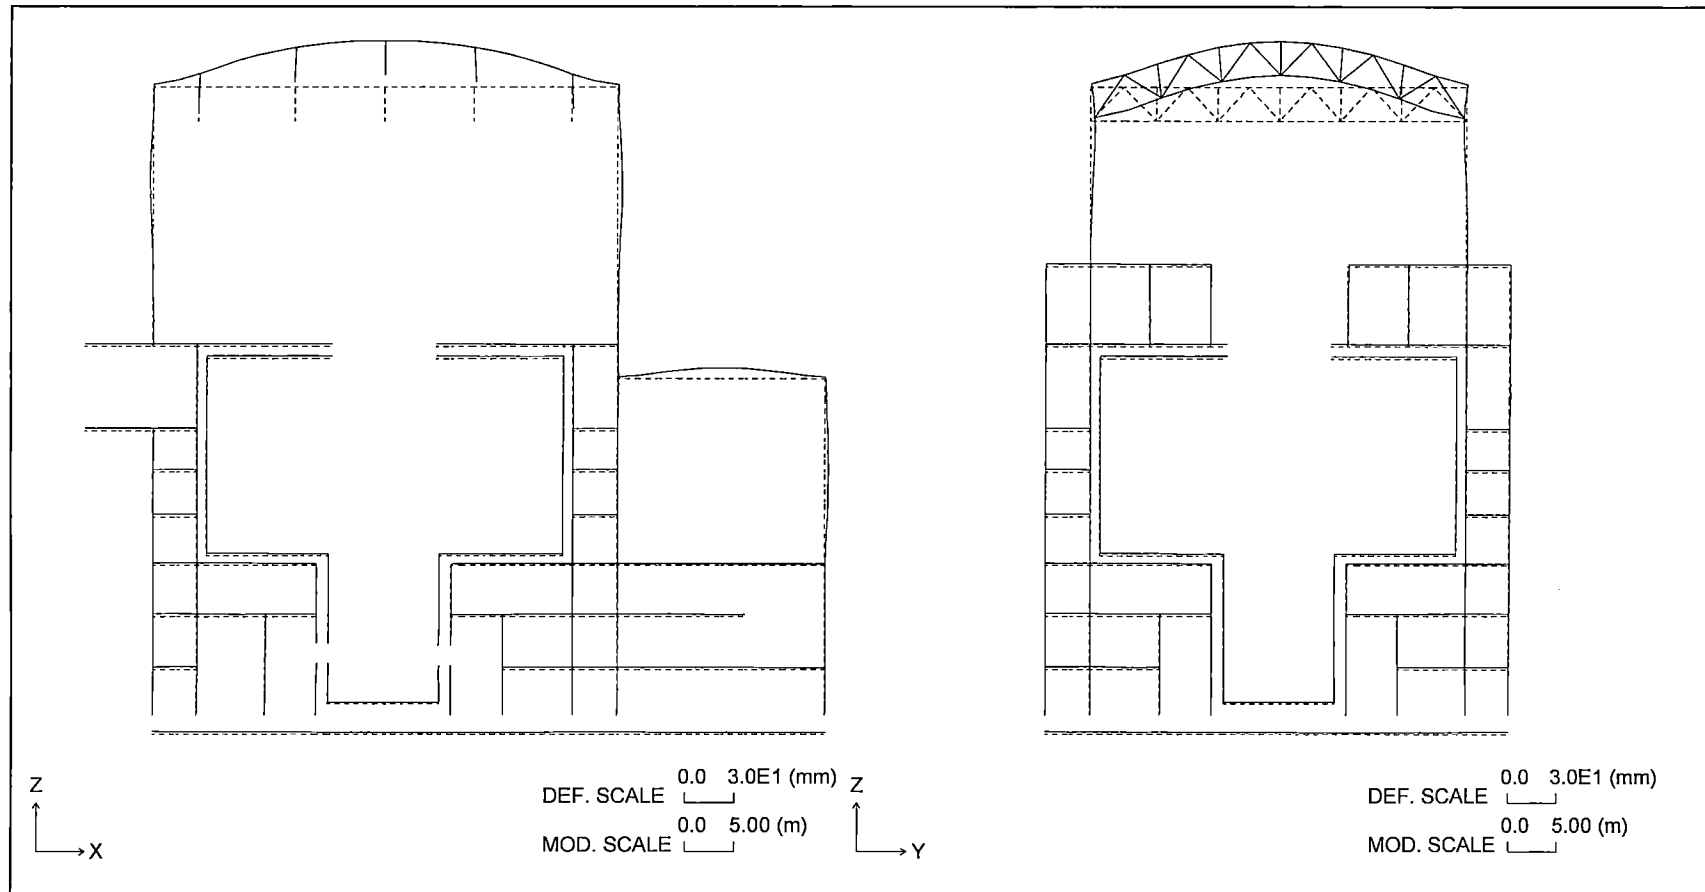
Section Deformation for Tornado Load (Differential Pressure)
